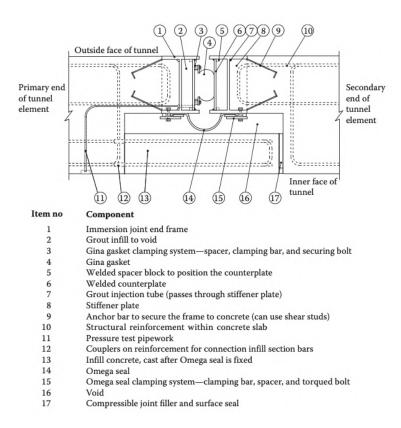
Components of immersion joints in concrete tunnel :section through roof slab (Lunniss and Baber, 2013)
